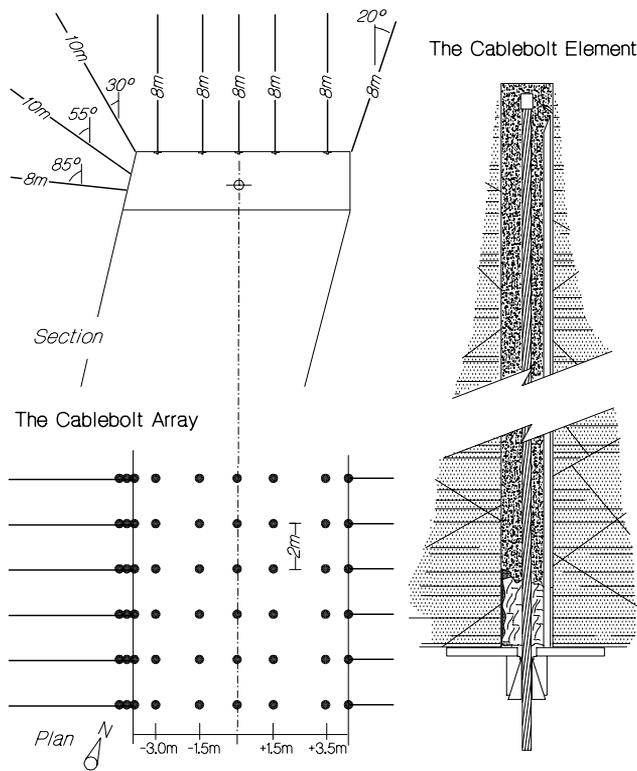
The cablebolt system (angles and spacings are examples only)
